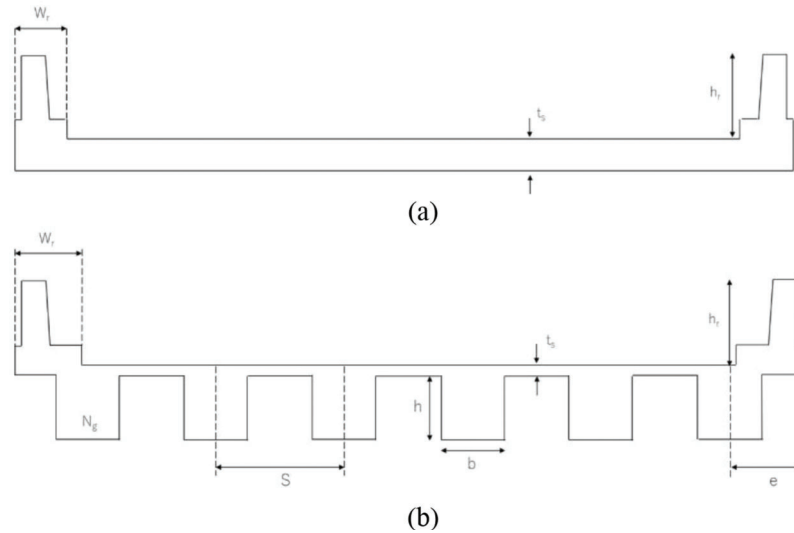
Geometrical parameters obtained from bridge drawings: (a) slab and (b) T-beam.
